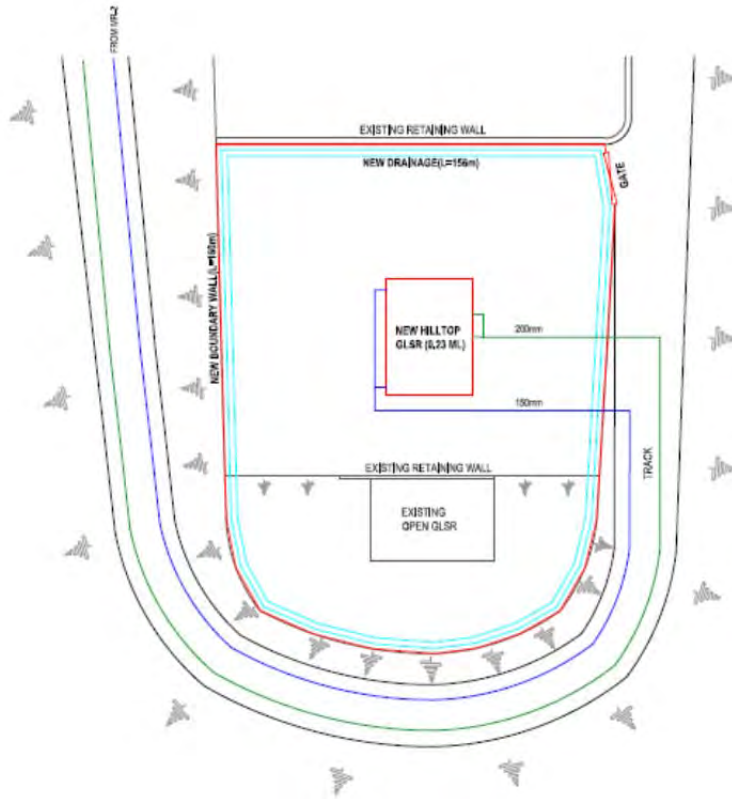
Proposed Construction Site of New GLSRs at Langol Housing Complex
